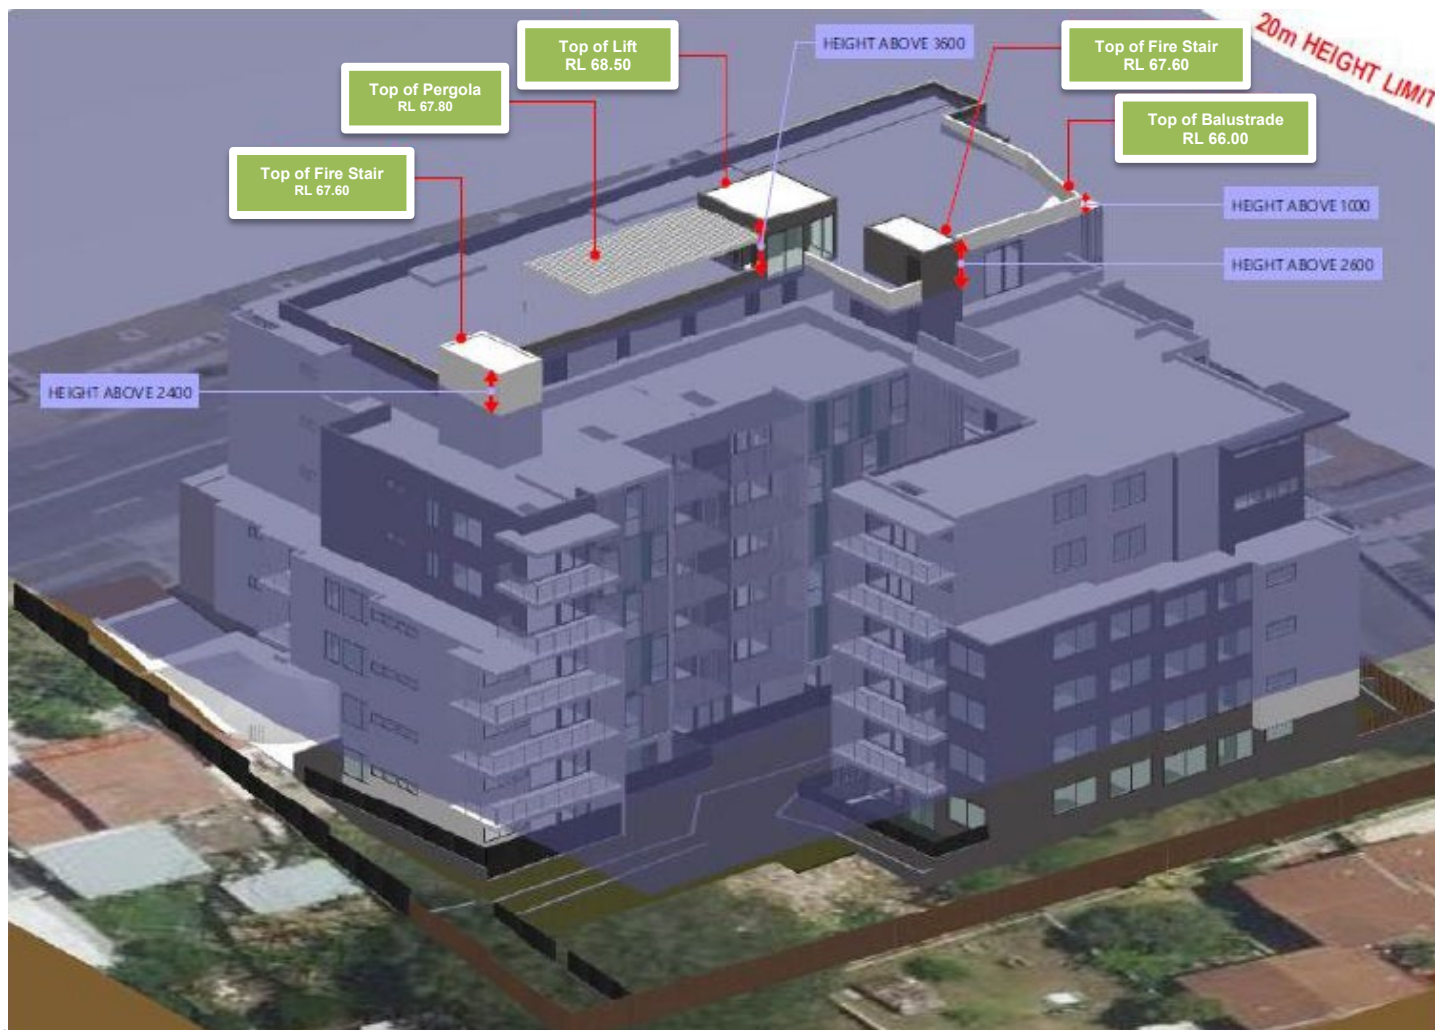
Aerial view demonstrating the components of the development which are above (shown in white) and which are below (shown in grey) the 20 m height plane relative to the ground level. Viewed from the south-east.
